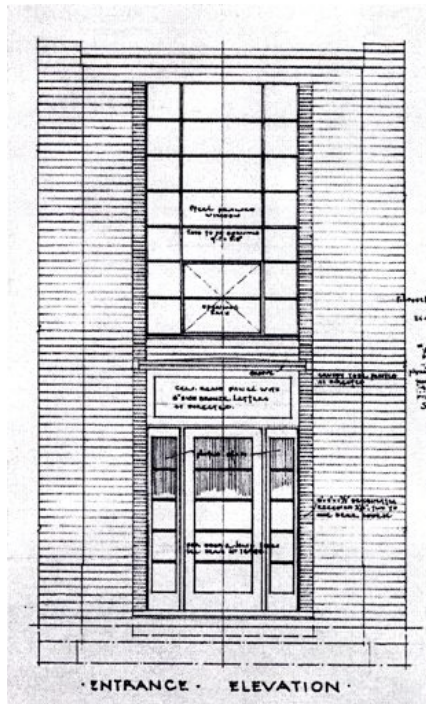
Entrance elevation, Griffith Flats, Department of Works and Housing, Canberra, 1947. National Archives of Australia, NAA: A2617, Section 30/16987.
